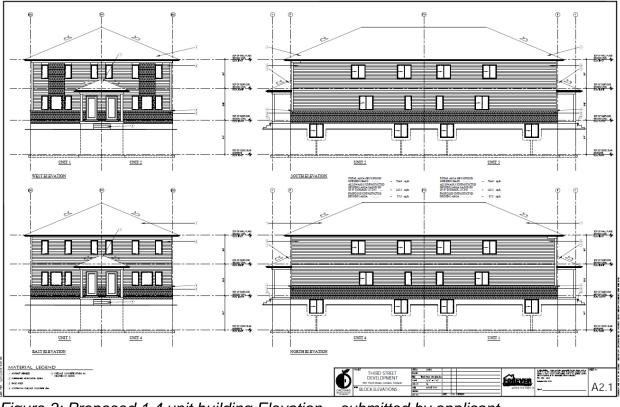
Proposed 1 4 unit building Elevation - submitted by applicant
